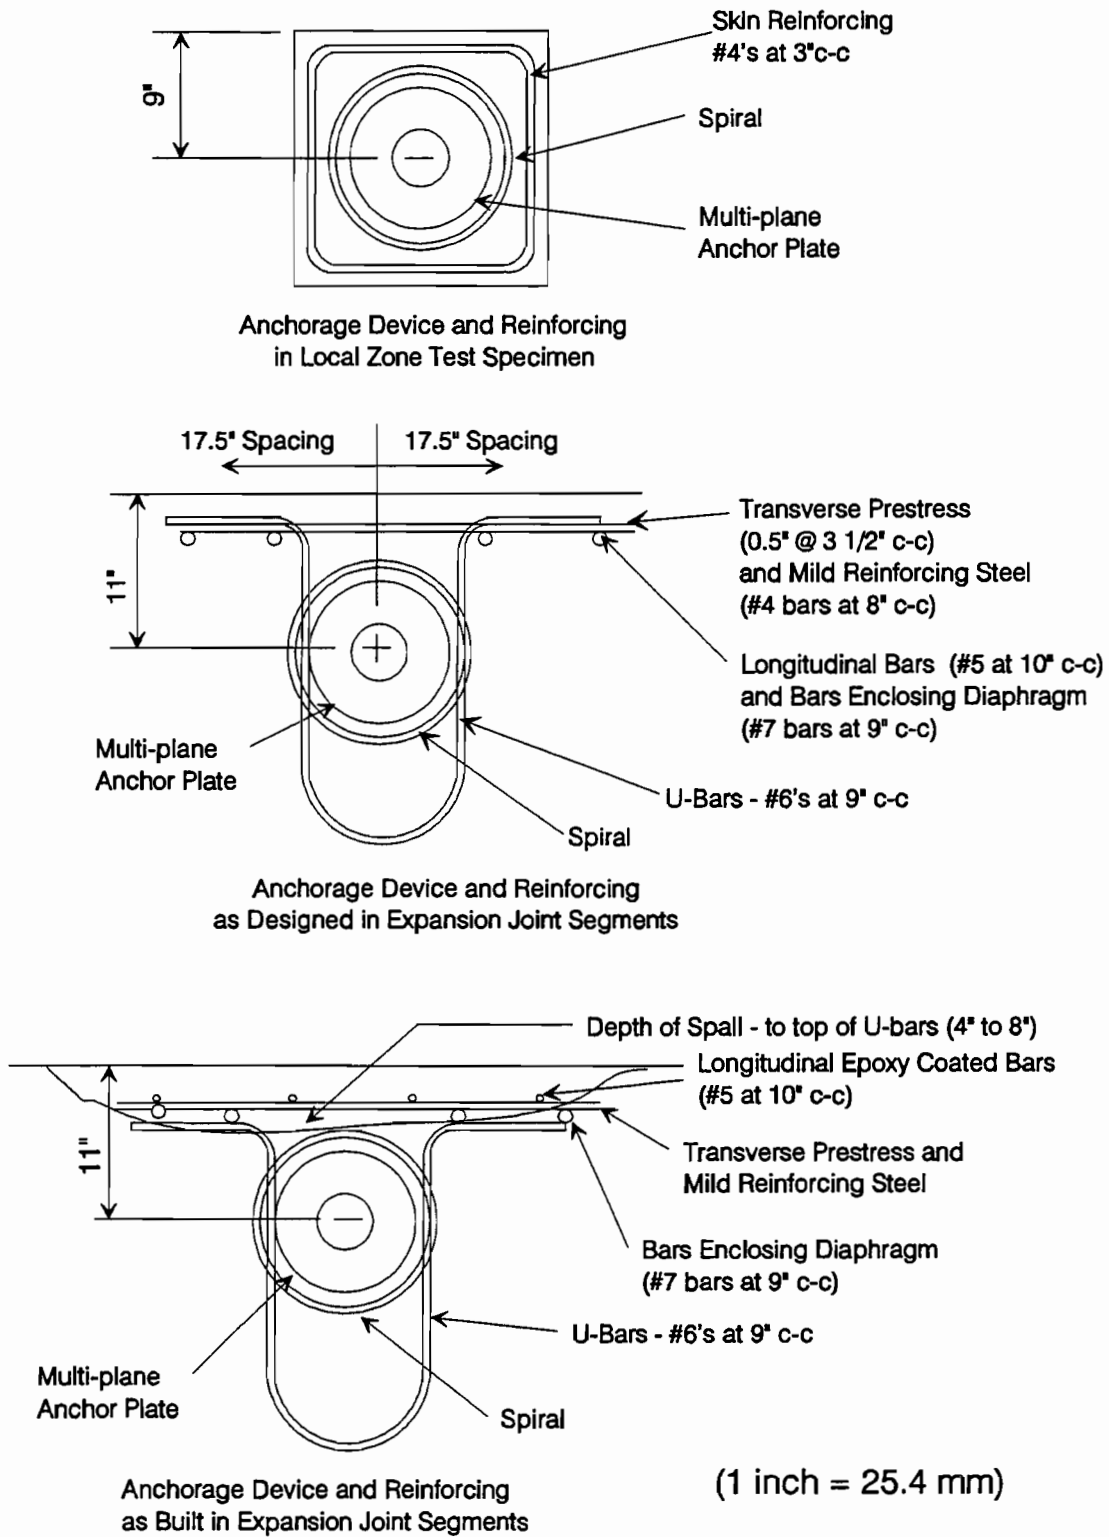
Comparison of reinforcing steel in local zone test specimen and expansion joint segment.
